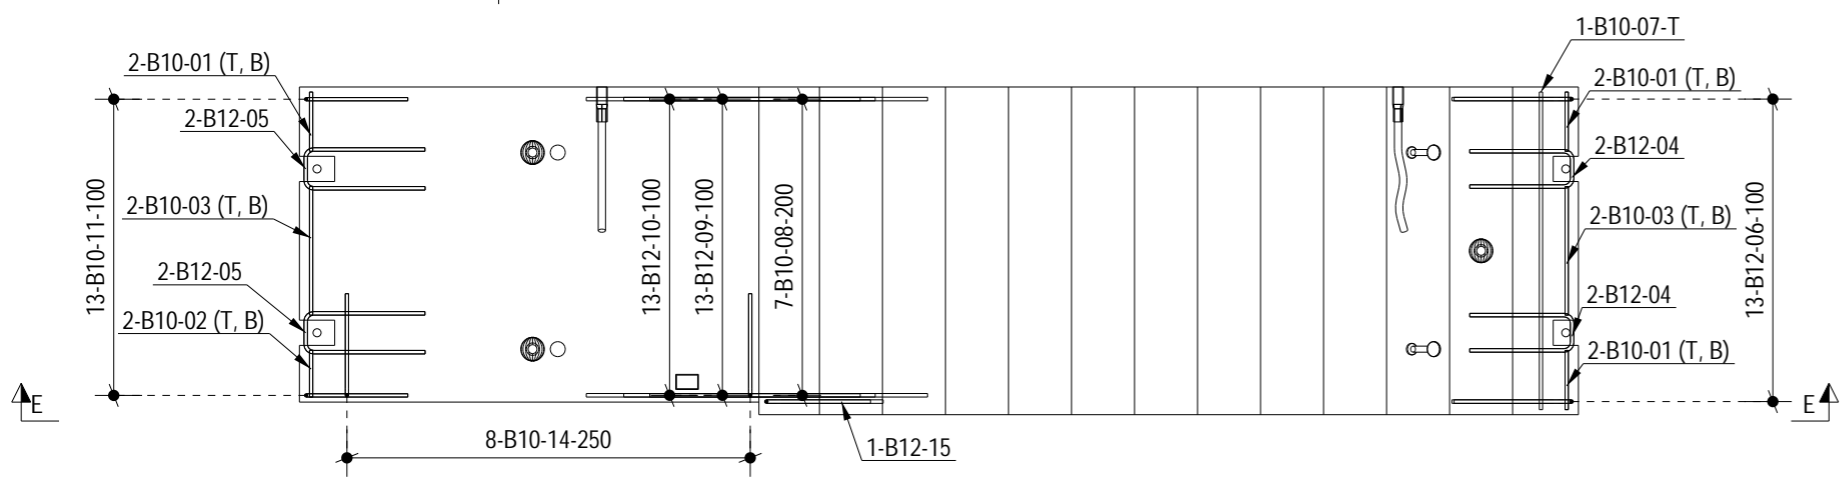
BYL-1462-SF-0005-GA1 Rev: C01
